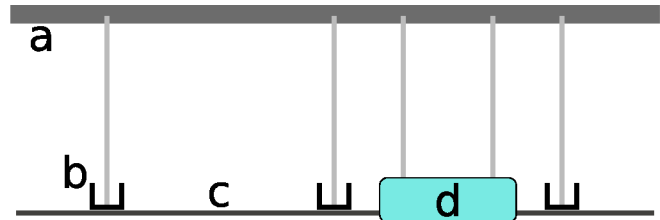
A common suspended ceiling structure. (a) Building structure. (b) Suspended ceiling beam. (c) Ceiling panels, attached to beams with screws. (d) Light fitting, suspended directly from the building structure.
